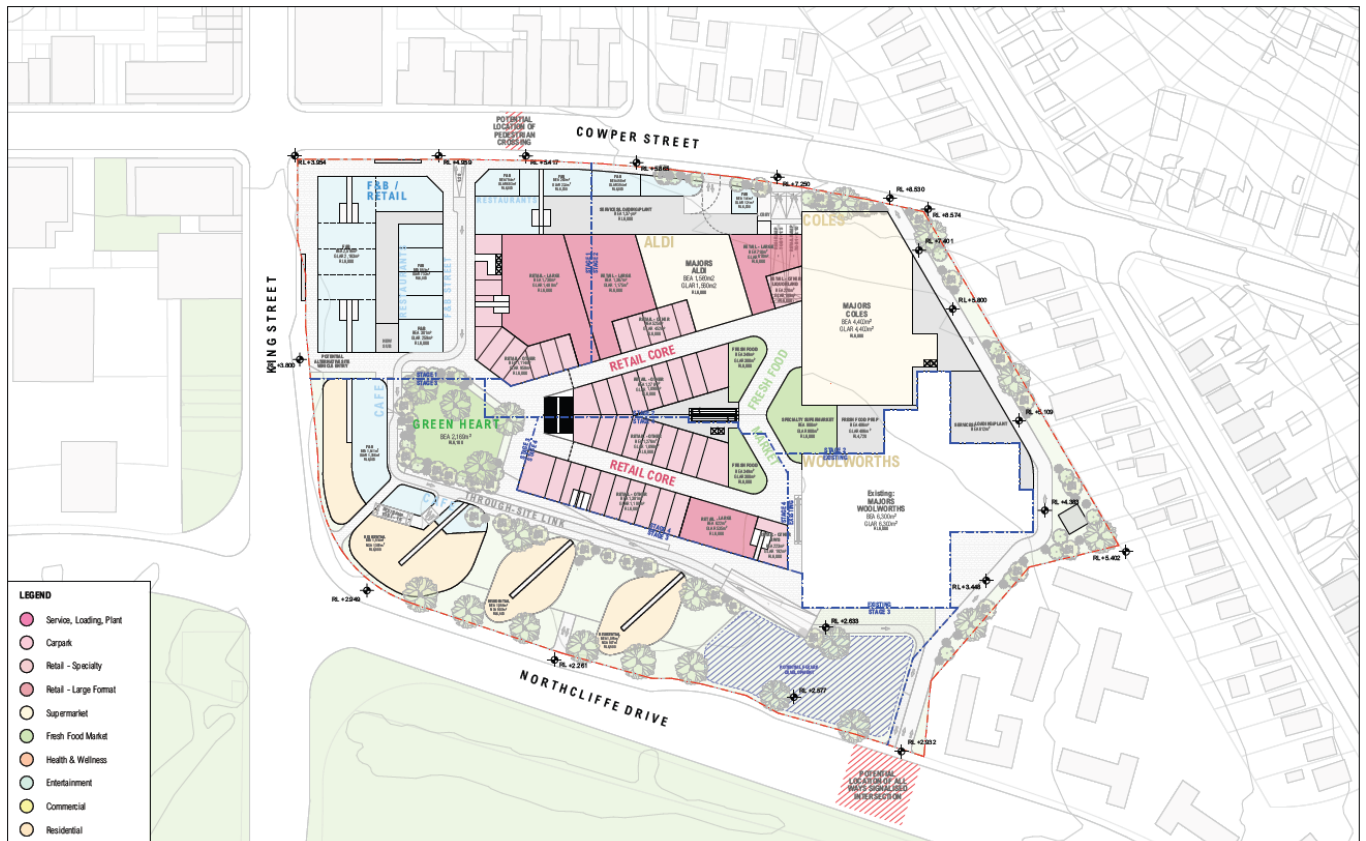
Proposed Ground Floor Plan, reference design (CHROFI)
